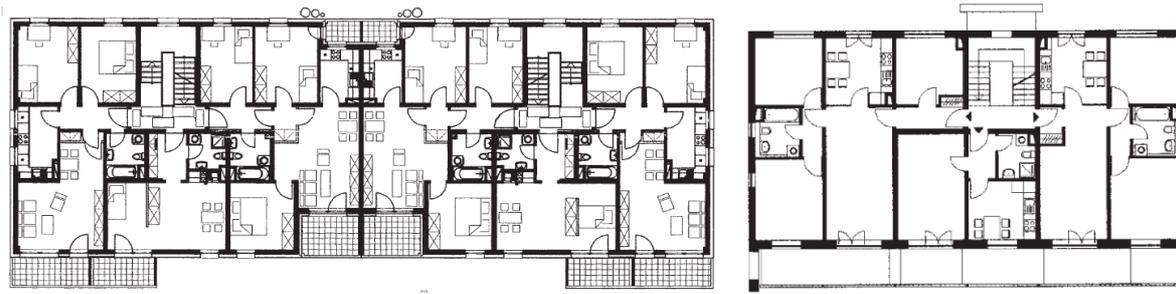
Floor plan view of residential complexes (left) and apartment block (right) (source: (Schottkowski-Bähre, 2000))
